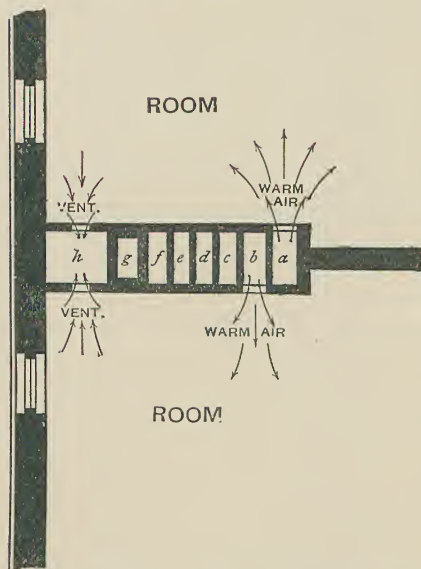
Plan showing Stack of Inlets and Outlets, "Smead" System.
